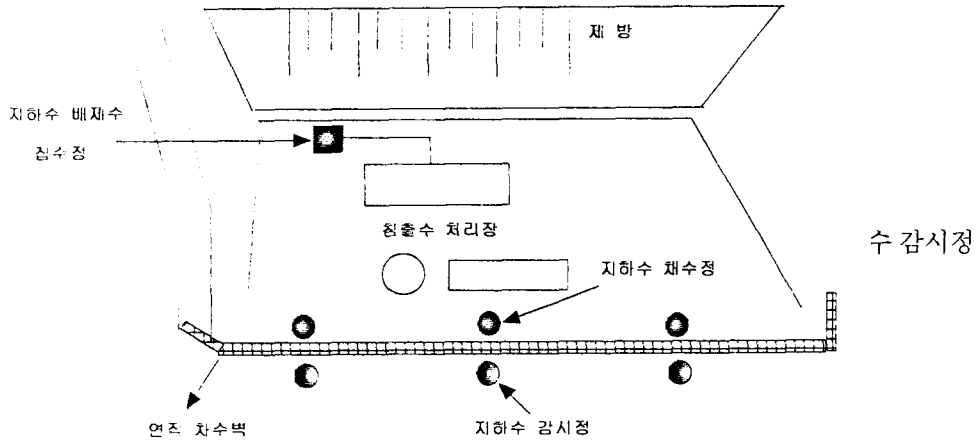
Layout of Deep Soil Mixing Cutoff Wall to Prevent the Transport of Contaminated Groundwater
